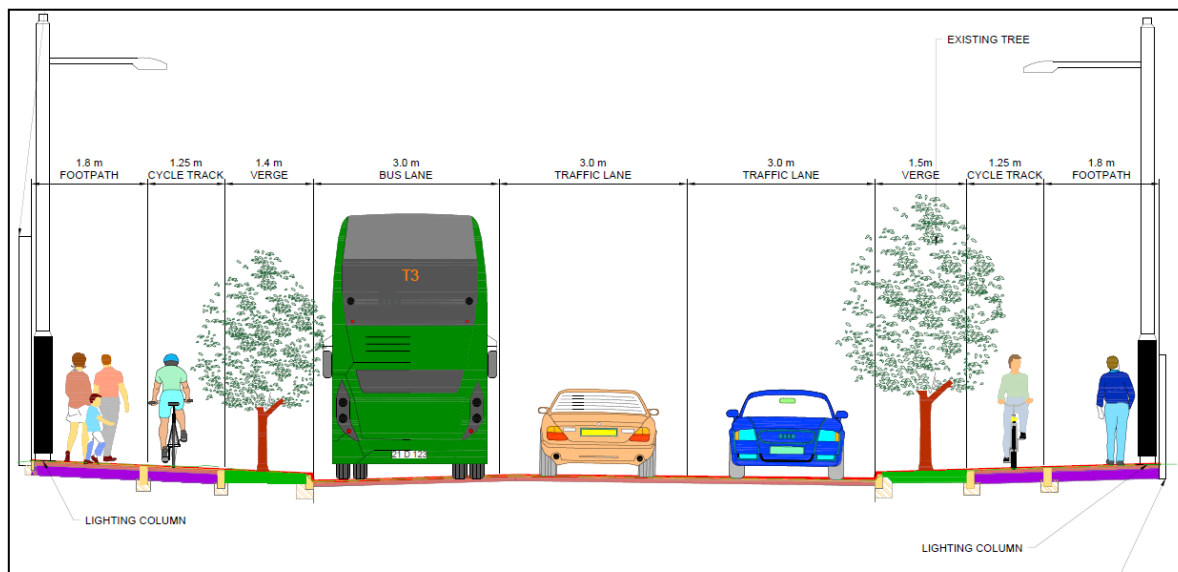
Extract from Typical Cross Section Sheet 5 at St. Mobhi Road
